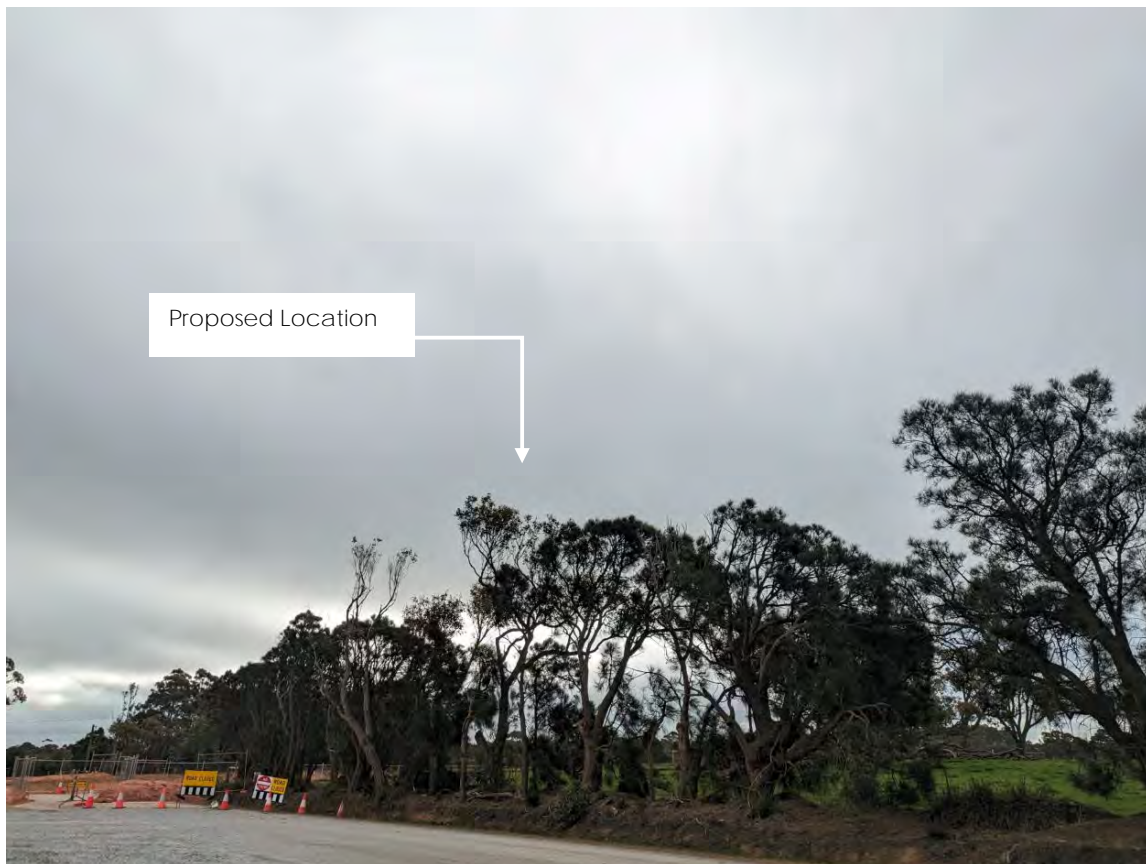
View of proposed monopole location looking north west from Lancaster Road (Source BMM)
